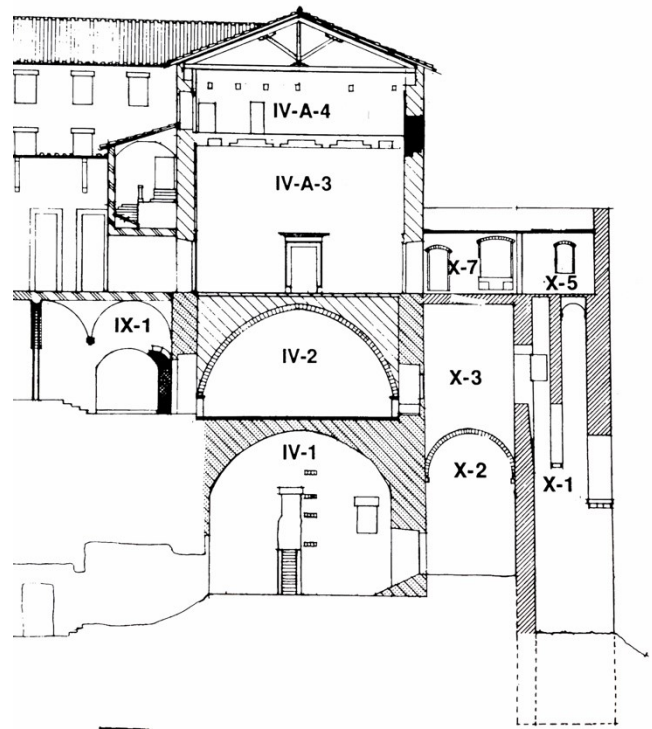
Viterbo, Papal Palace, section of the latrine tower (Radke 1996, drawing 9).
